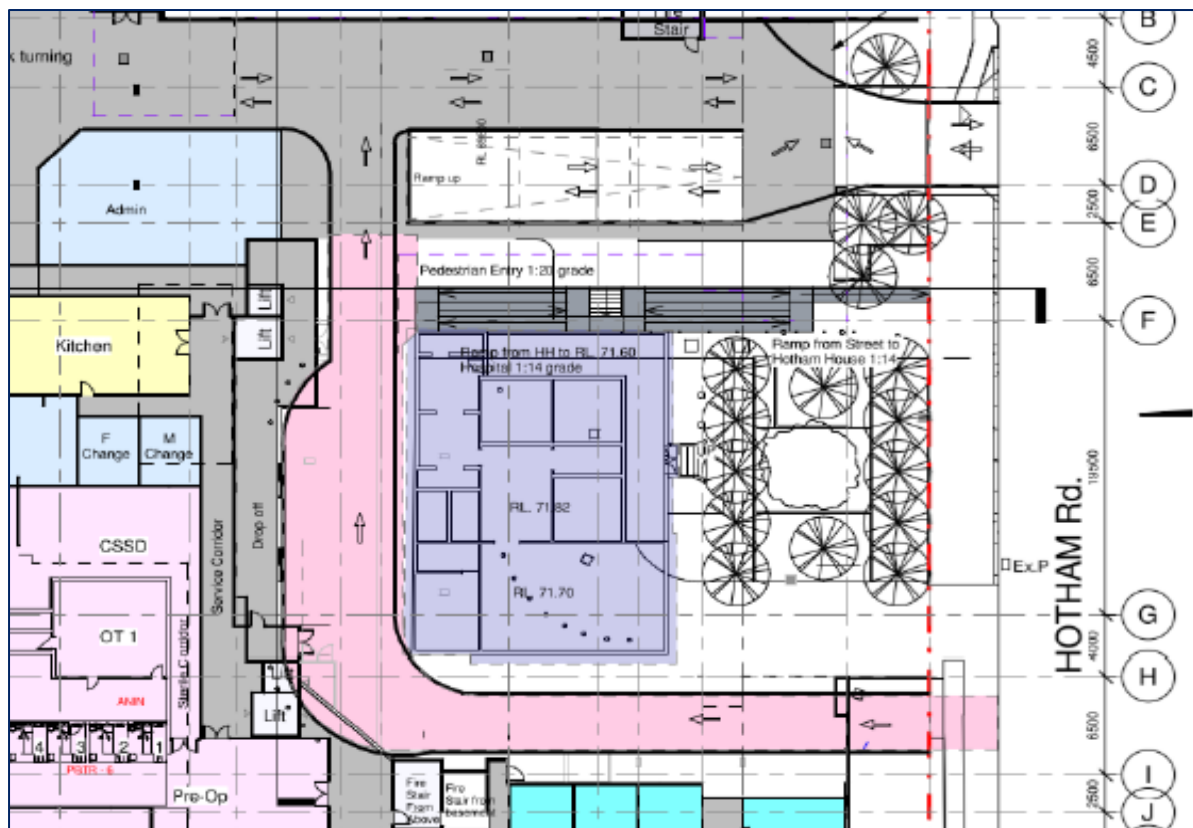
| Alternative design ground floor access arrangements (Hotham House shown in purple) and repositioned driveway shown in pink (Source: Applicant's RtS 2022)
